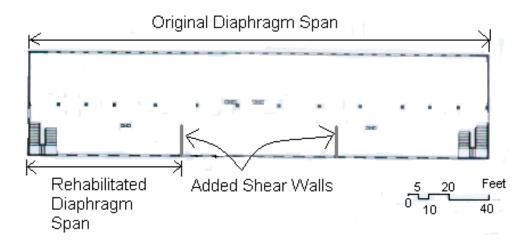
Addition of shear walls to decrease span of diaphragm
